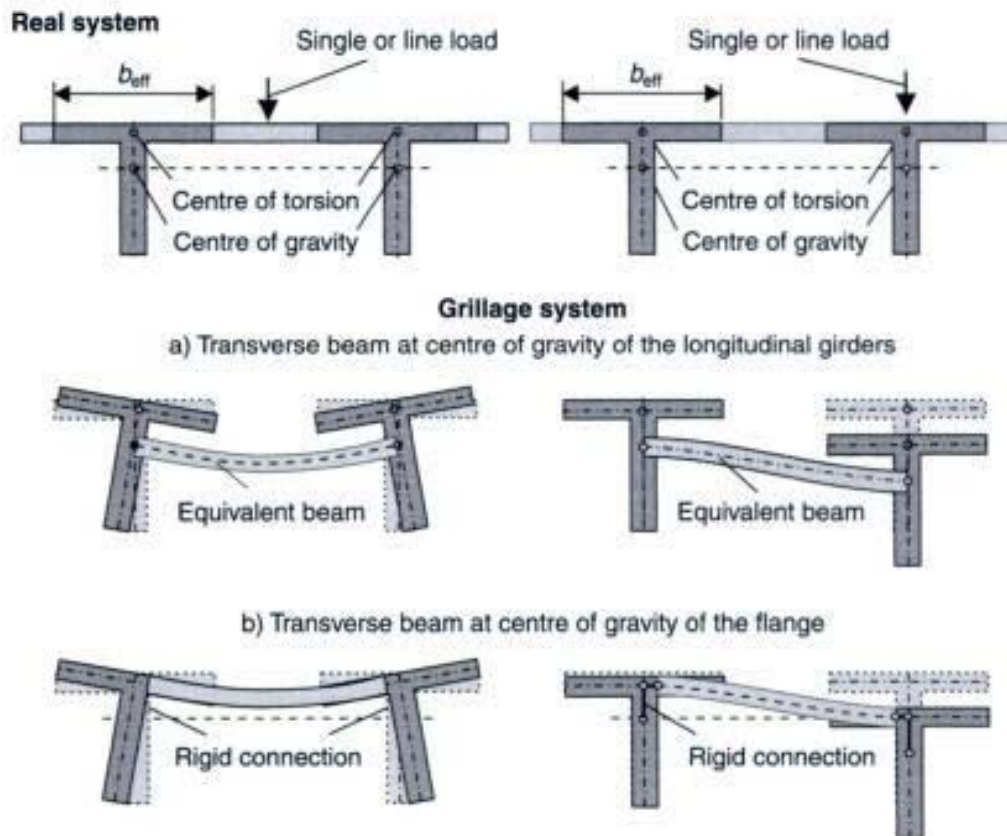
Deformation of the longitudinal and transverse beams under constant line loading
